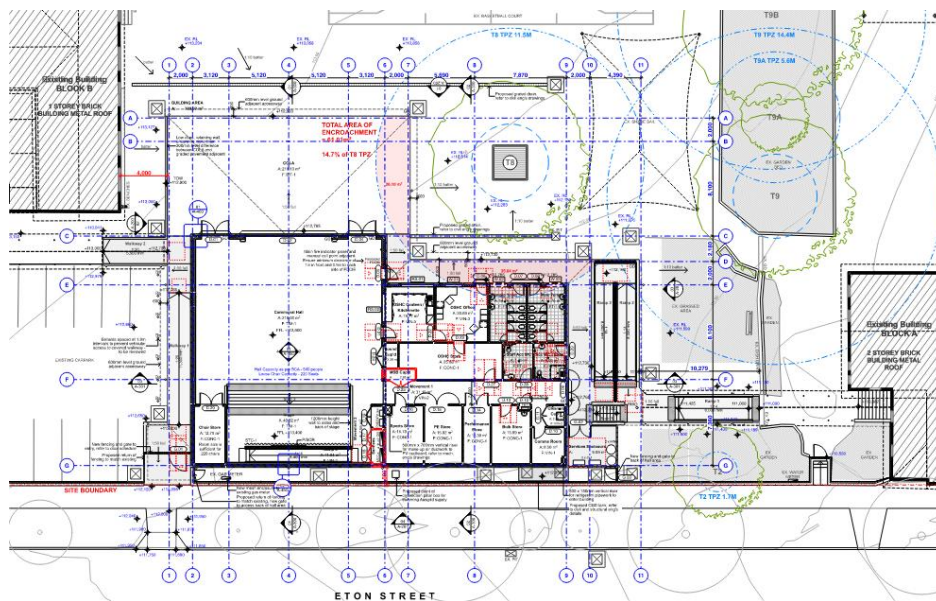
Site/Floor Plan (source: Ground Floor Plan by BKA Architecture)
